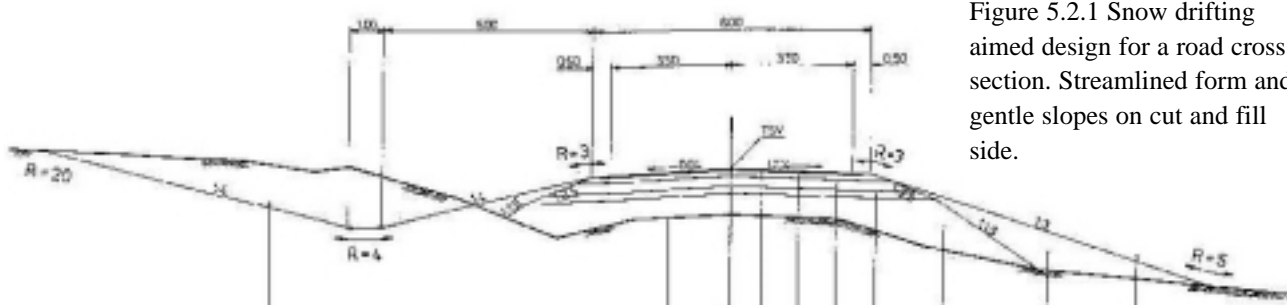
Snow drifting aimed design for a road cross section. Streamlined form and gentle slopes on cut and fill side.
